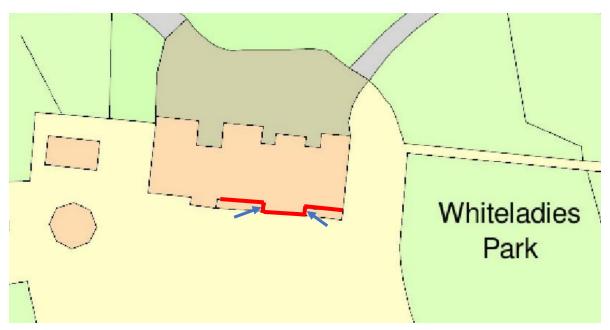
Enlarged extract from site Location Plan showing Council's view of original rear elevation and side elevations.
